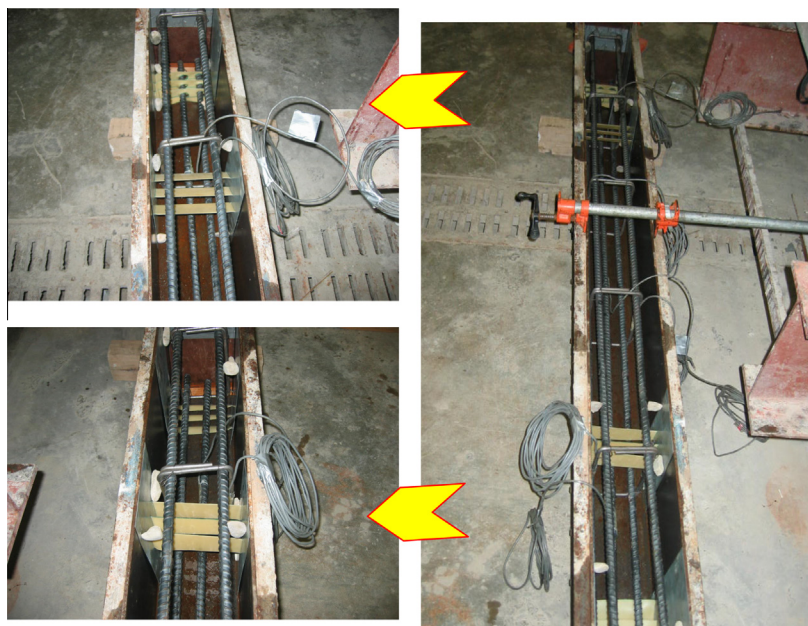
Manufacturing pilot beam with pre-cracks groups.
